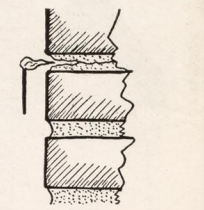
HOW TO LOCATE A LEAK IN A CHIMNEY WALL.
